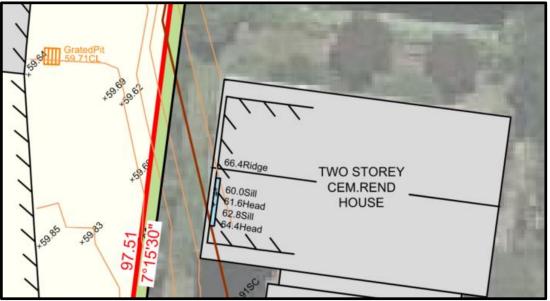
31 Barnsbury Road Group 2 First Floor Windows
